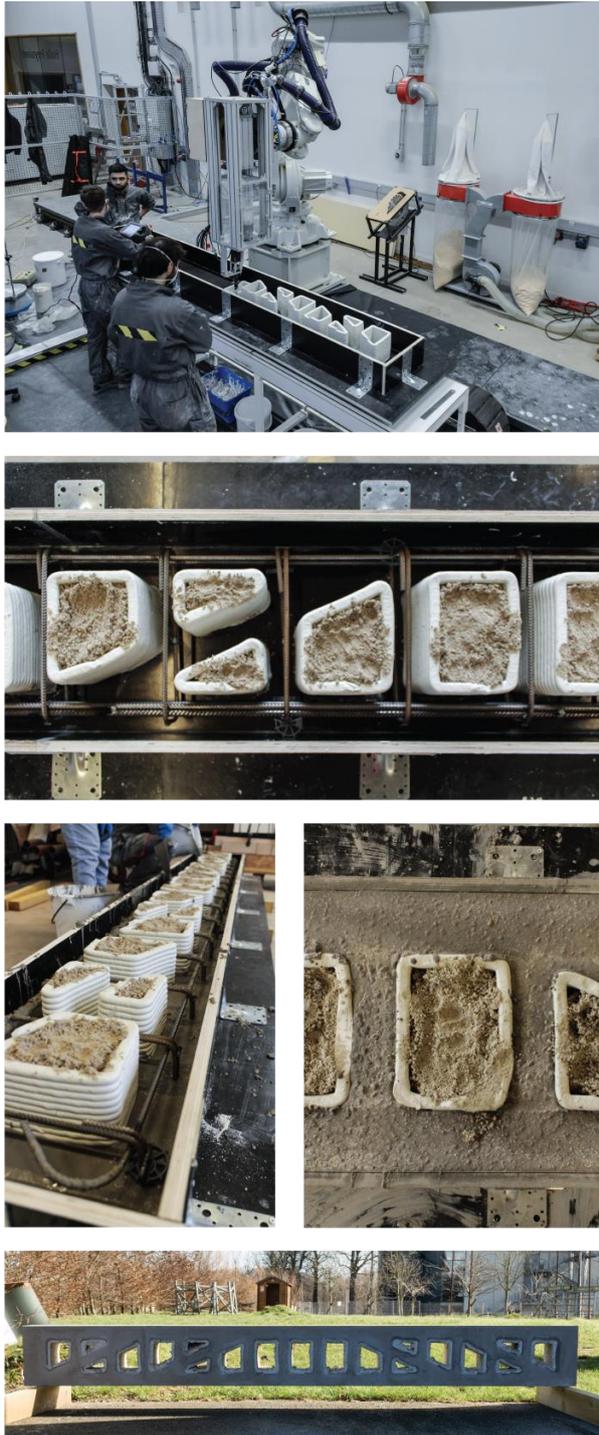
Fabrication of the second prototype. From top to bottom: printing of the moulds, insertion of the rebars and filling of the moulds with sand, pouring of the concrete, demoulded beam.
